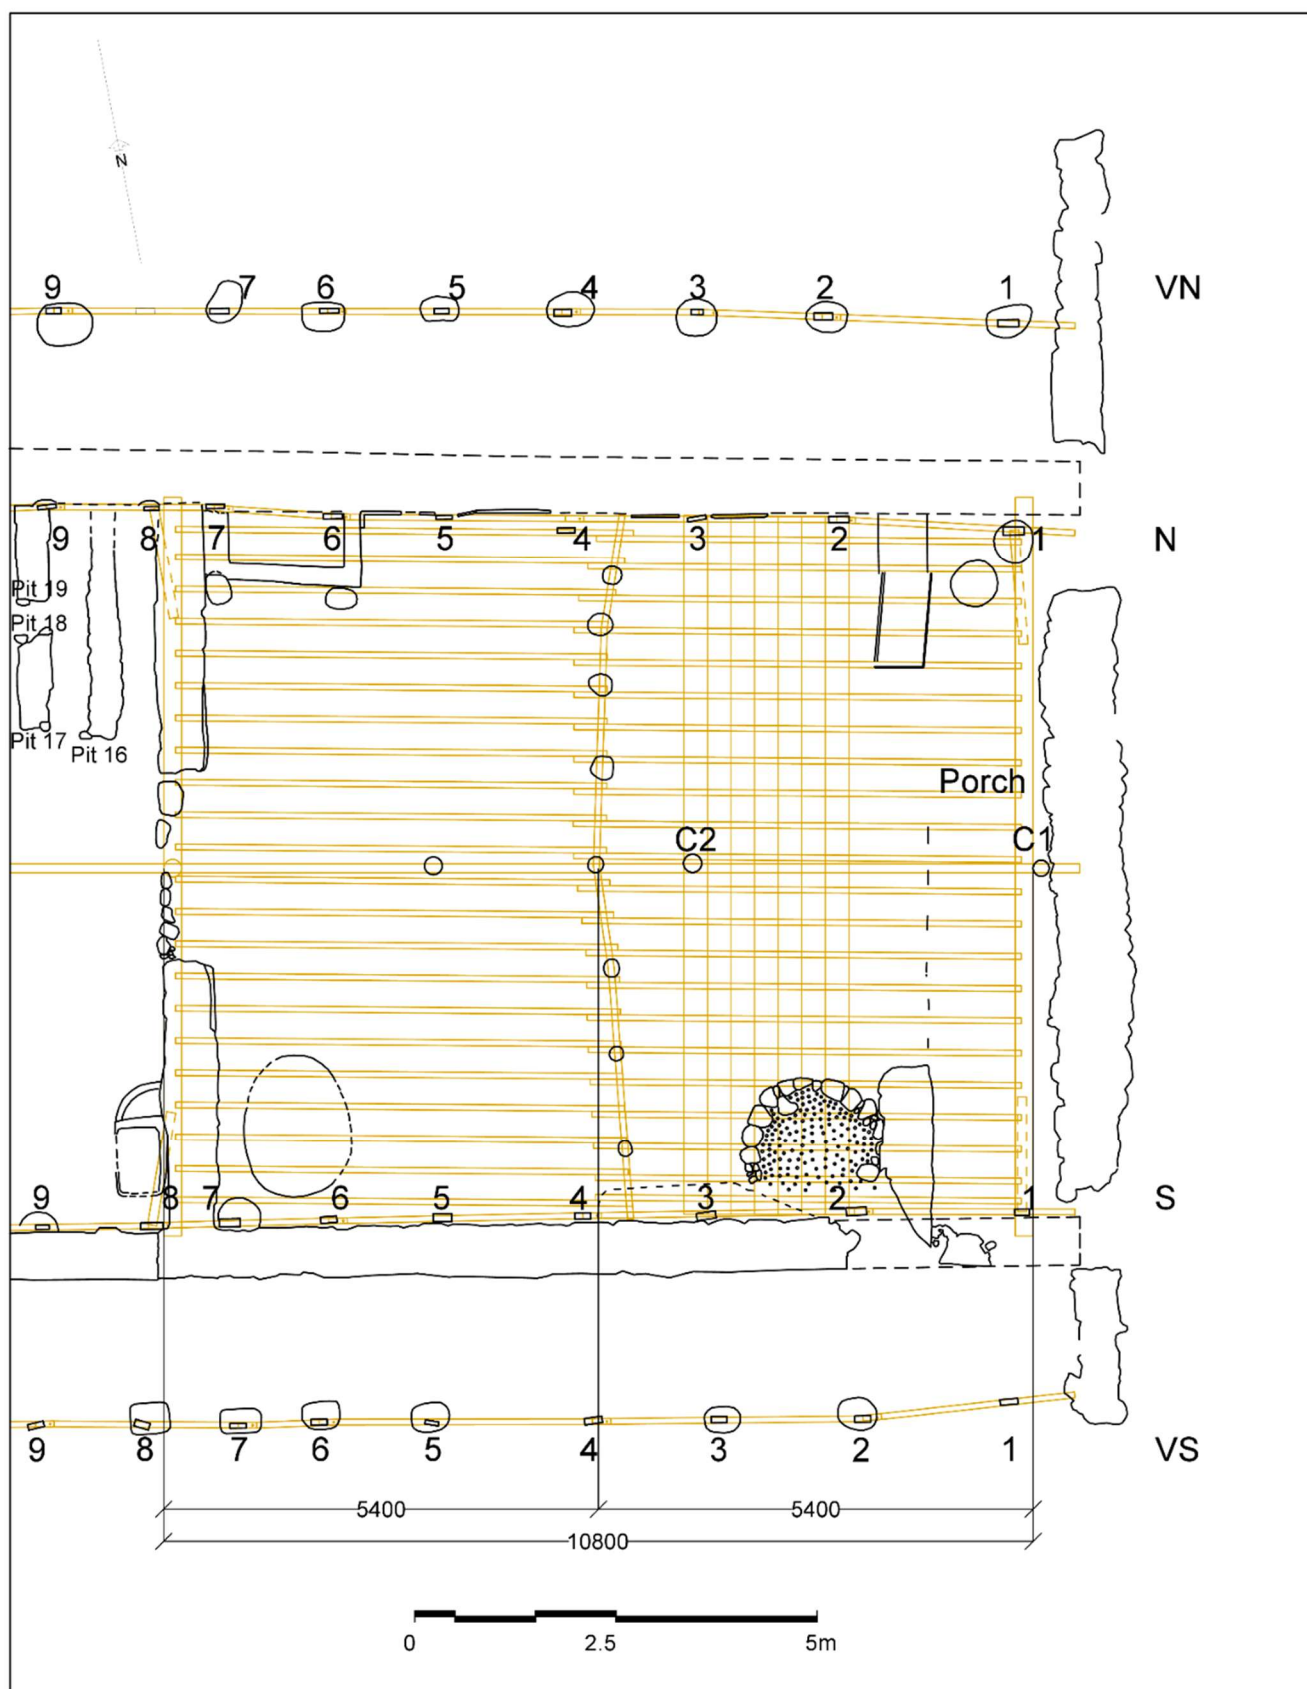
3. Reconstruction of the plan of the loft above the ER and the Porch (in brown), superimposed on the existing plan of this part of the building (in black).
